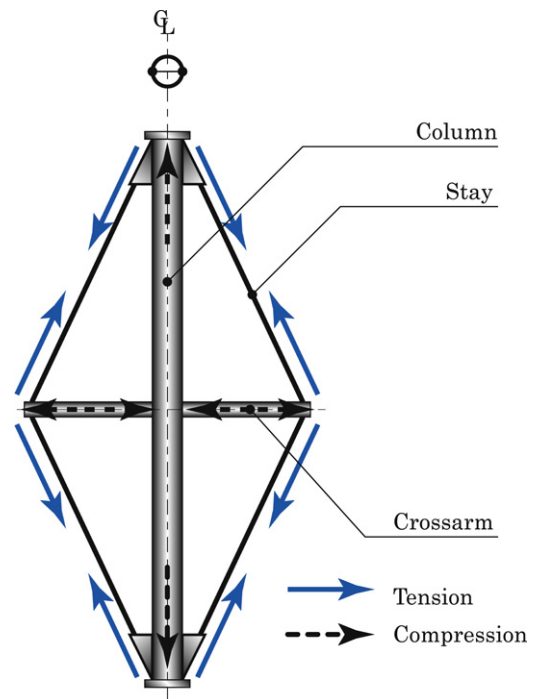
Principle of the prestressed steel stayed column: stays are pretensioned to provide lateral restraint against overall buckling.
